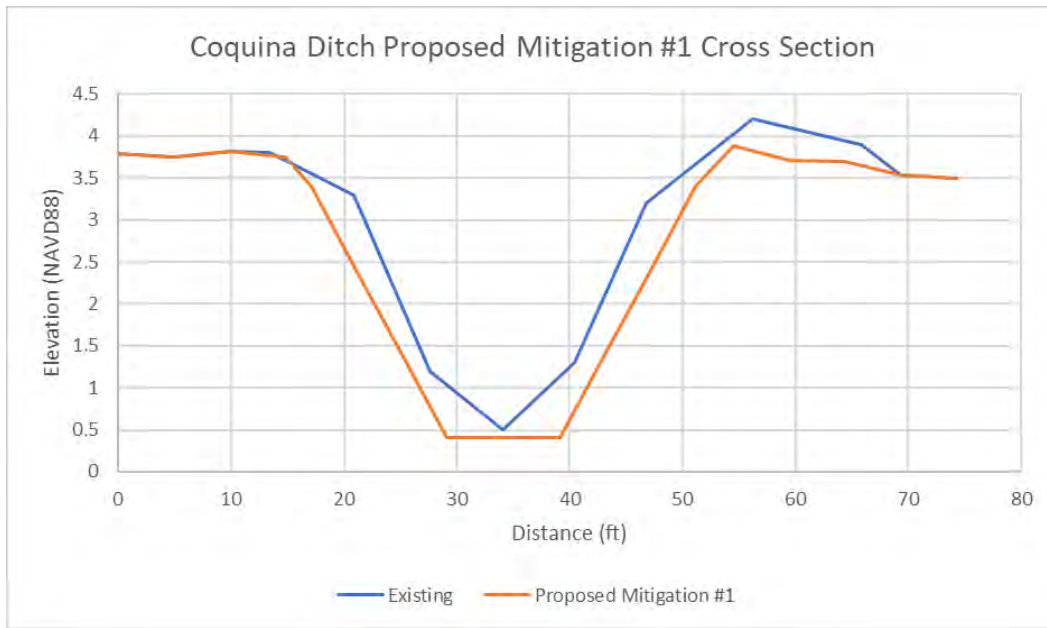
Coquina Ditch Mitigation #1 Cross Section
